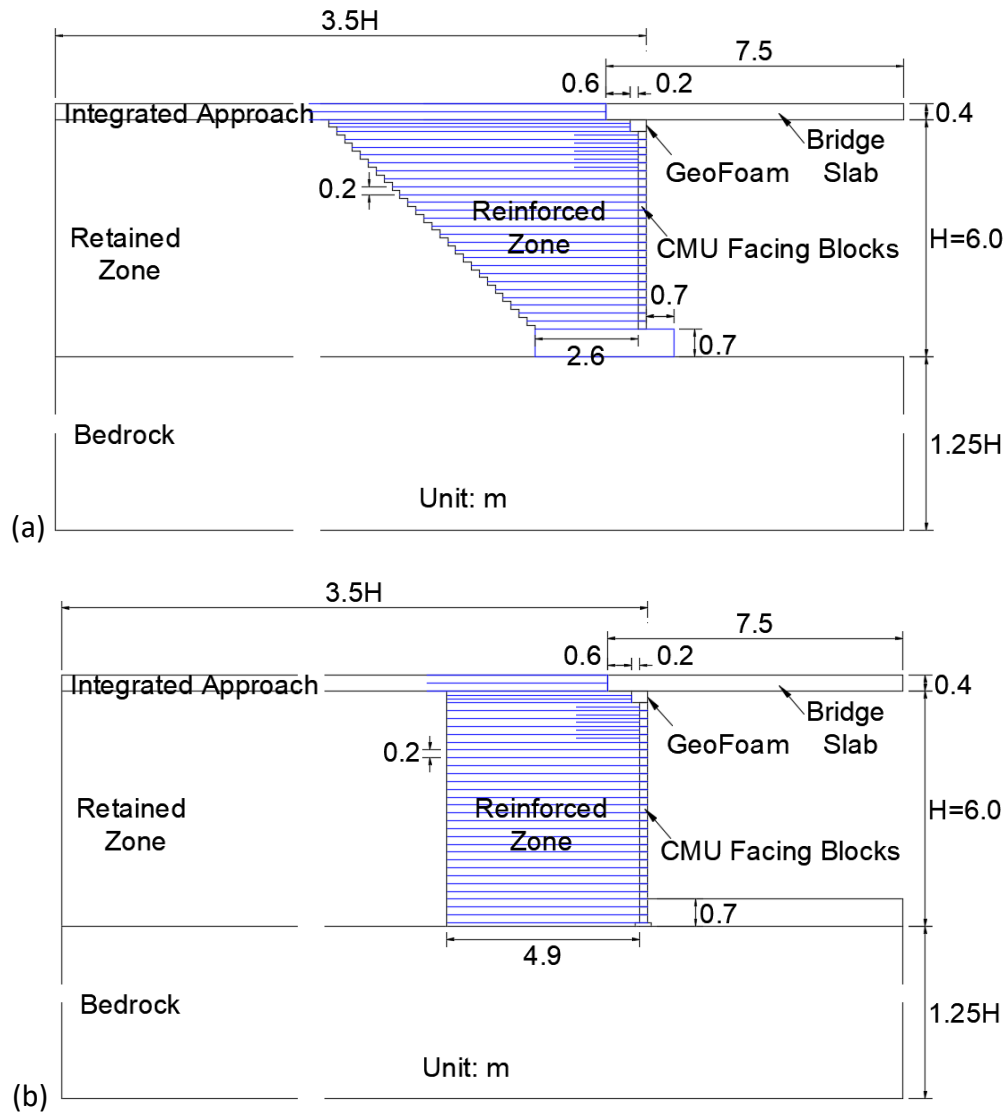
Schematic of two layouts: (a) Trapezoidal layout; (b) Uniform layout.
